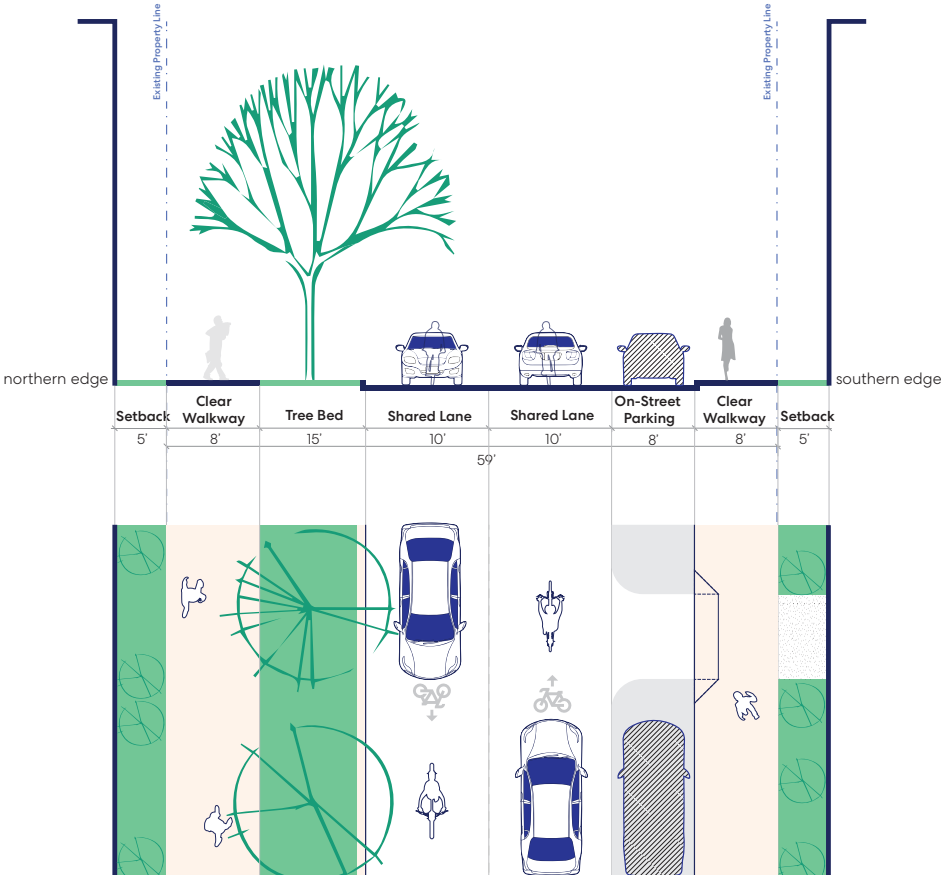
Typical Portage Avenue section between Ash Street and El Camino Real
